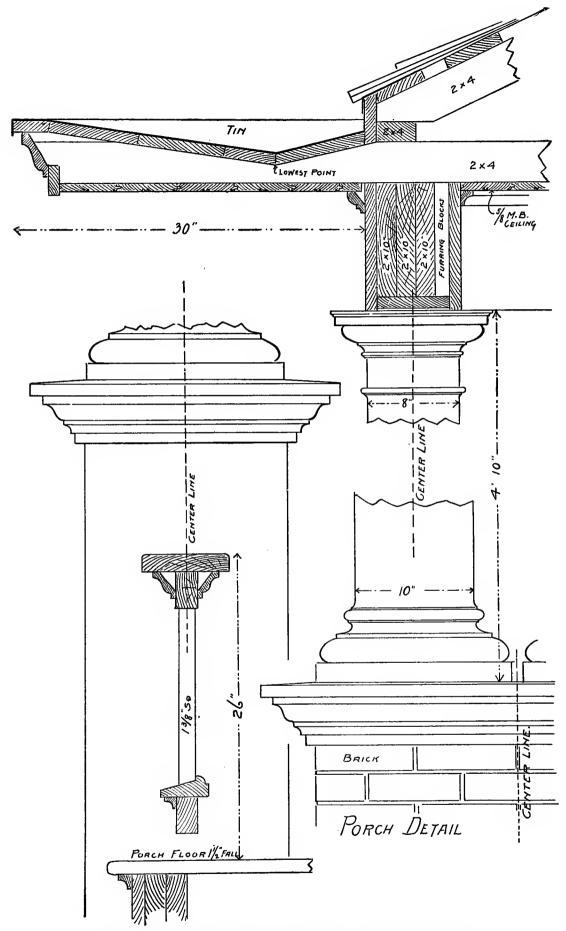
DETAILS OF PORCH CONSTRUCTION
